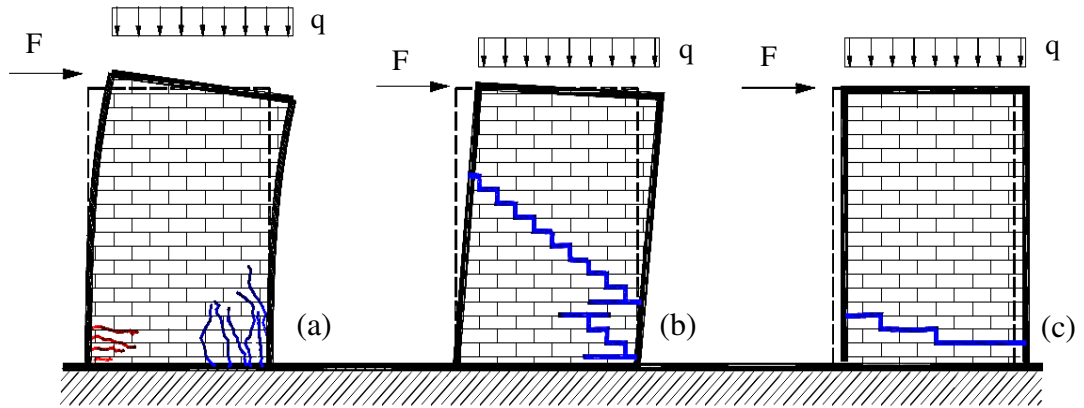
Main in-plane failure mechanisms of a masonry portion: (a) flexural failure, (b) shear-diagonal failure, and (c) shear-sliding failure (Caliò and Pantò, 2014)
